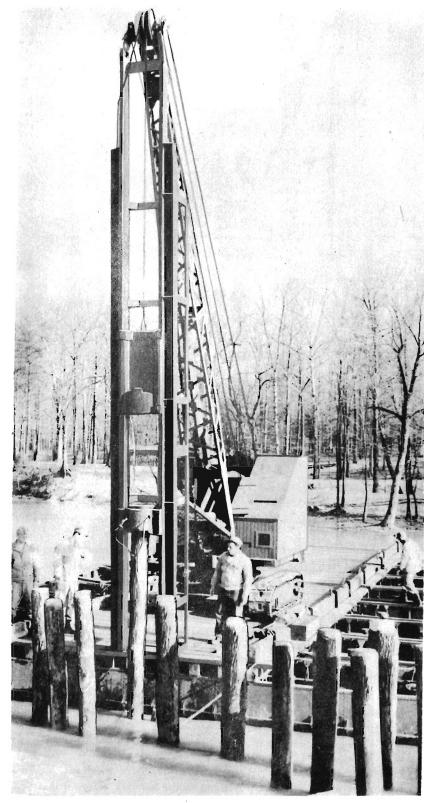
Shovel with crane boom and standard pile-driving attachment driving timber piles.
